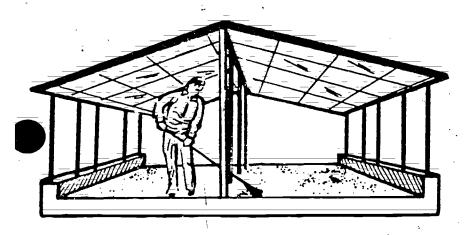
Plastic-covered concrete drying floor for coffee, Columbia
